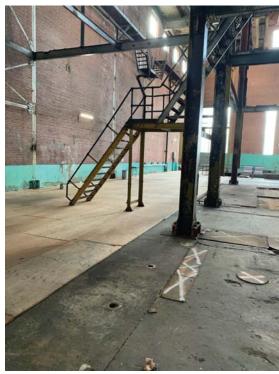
2nd Floor – Typical stair. Would not meet current codes for rise-run. Also stairs have some concerning connection details and low handrails.
